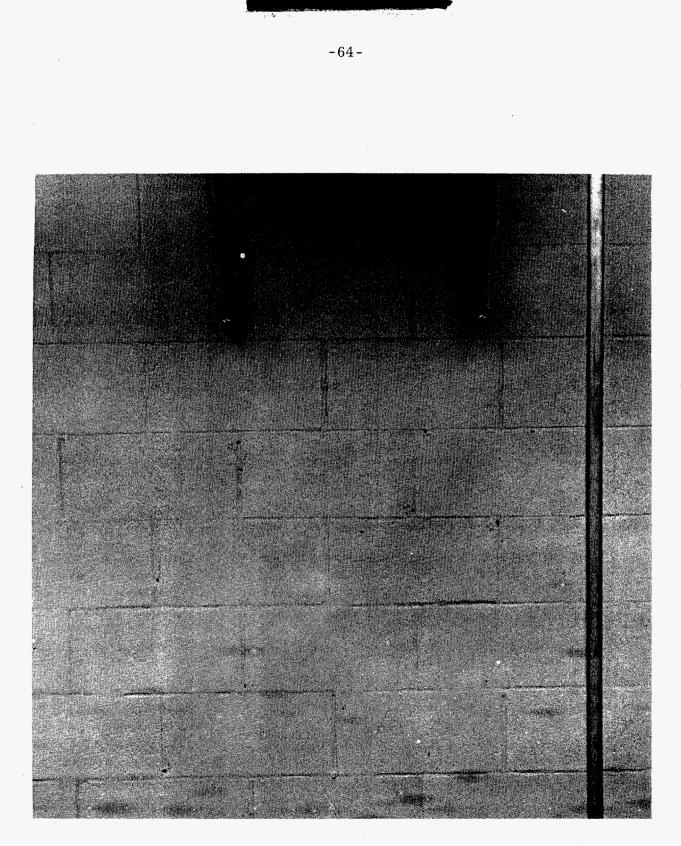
Building 479, extensive cracking under air conditioner, 0.21 cm/sec.
